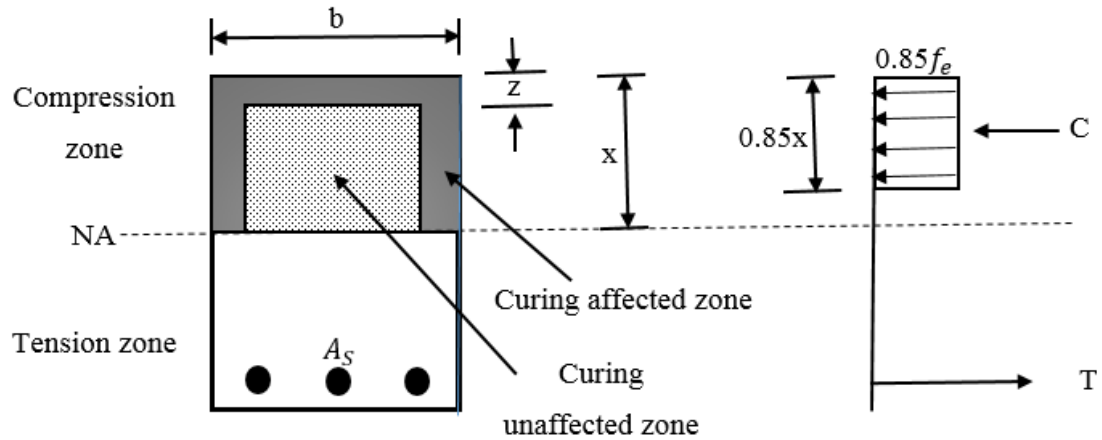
Cross-sectional view of the rectangular singly reinforced beam
